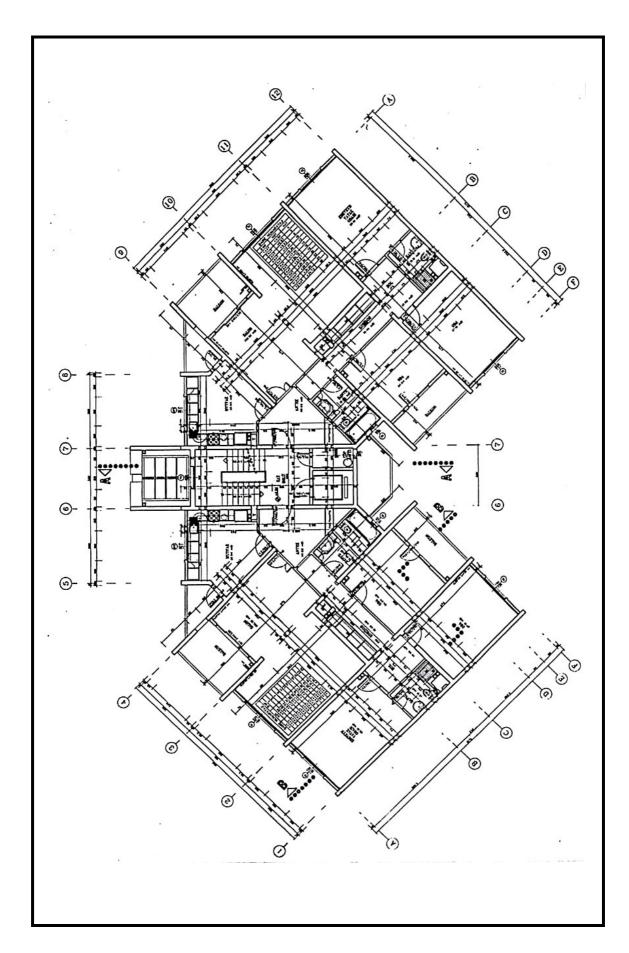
Mavişehir II; B Apartment Building Typical Floor Plan
